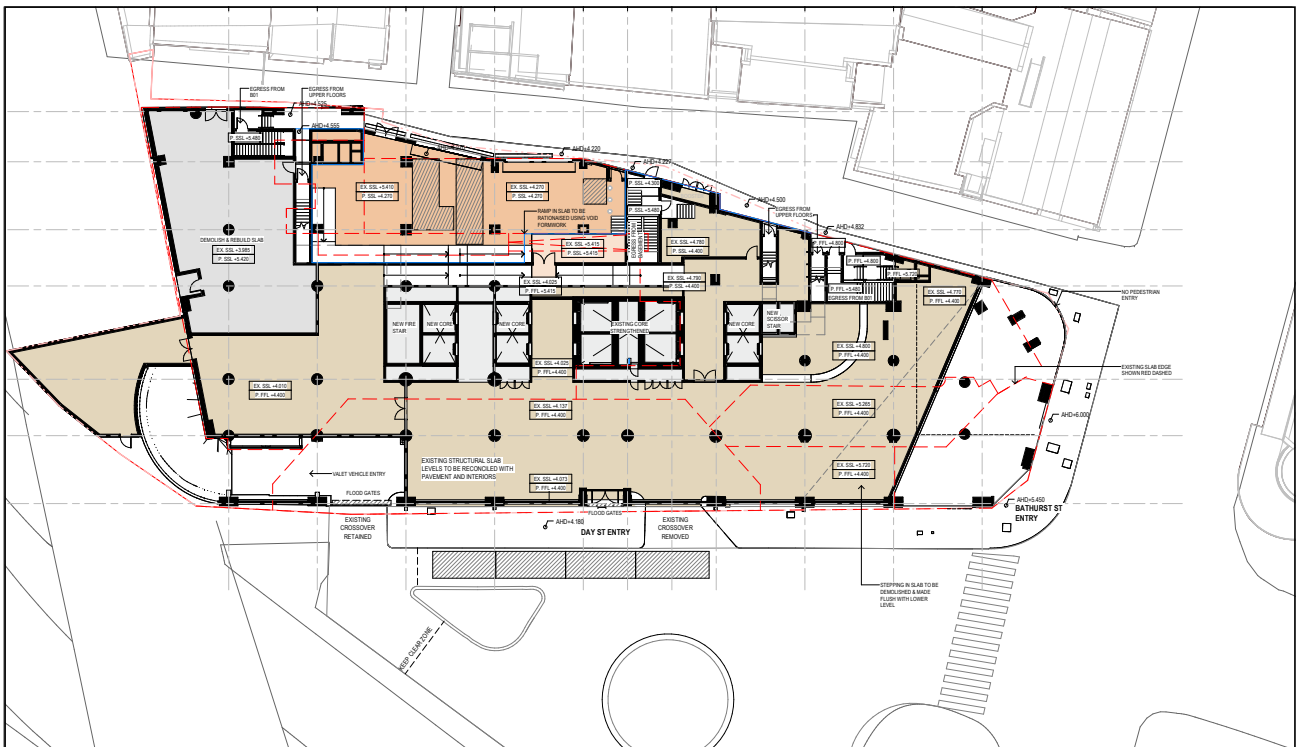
Proposed Ground Floor Layout (Source: Hassell).
